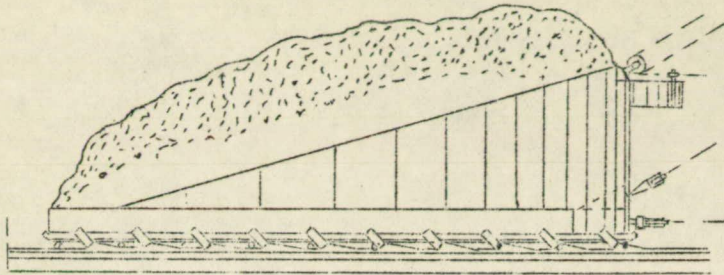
Concrete platform loaded with earth for anchoring end of centering.
